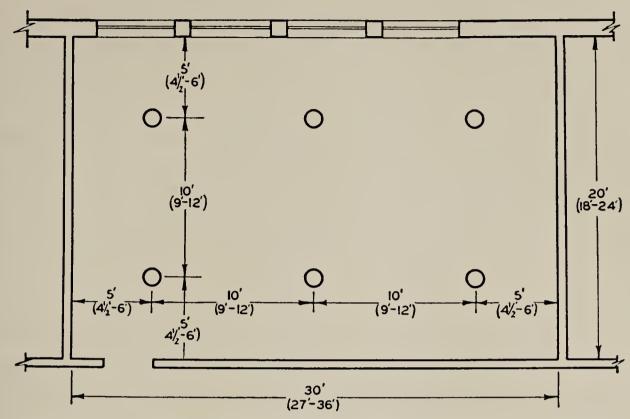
A lighting layout for a typical classroom, with a ceiling height of about 12 feet, and with dimensions in the range indicated.
